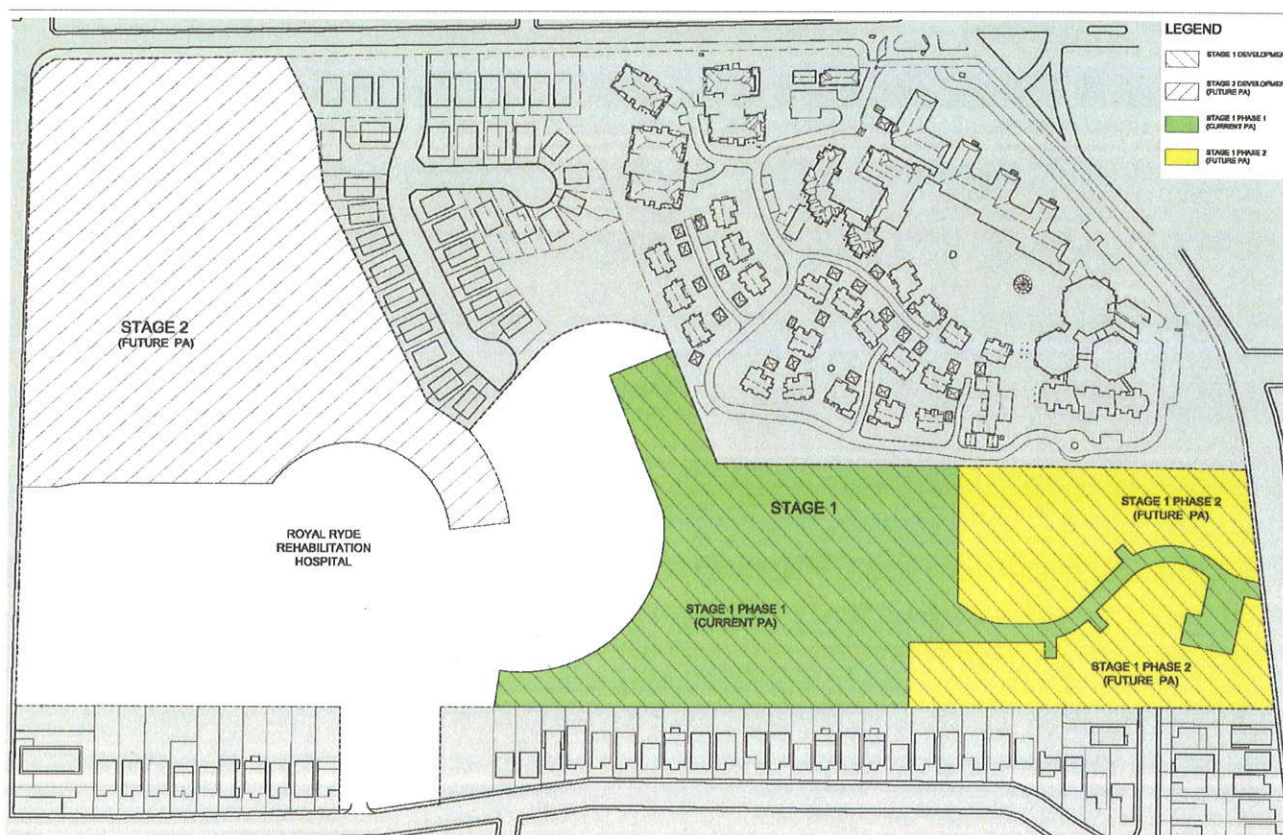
Indicative Plan of each of the various stages on the RCSS site
